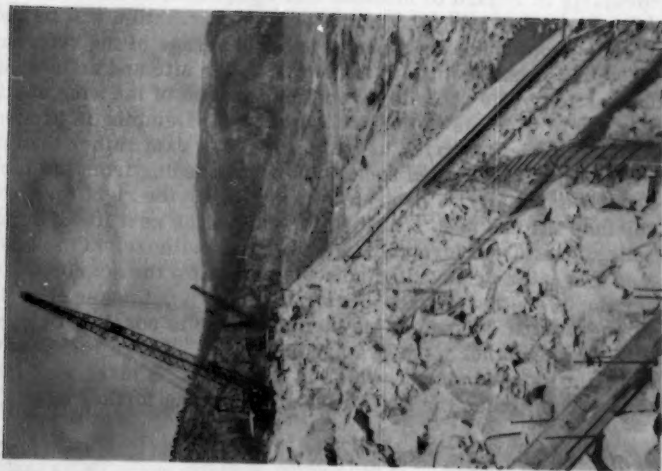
FACE CONSTRUCTION - WISHON DAM
